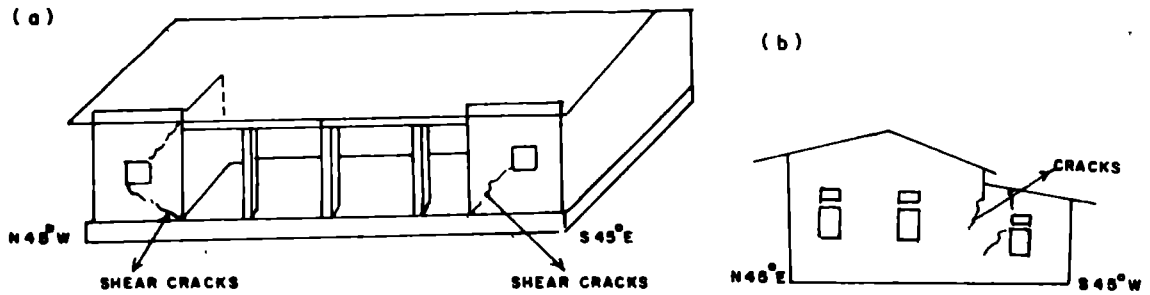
(a) BAINGA SCHOOL BUILDING SHOWING SHEAR CRACKS IN THE CUBICLES ON THE SIDES OF THE VARANDAH. (b) ELEVATION OF NW SIDE WALL SHOWING STEEP CRACKS IN THE SAME BUILDING.
